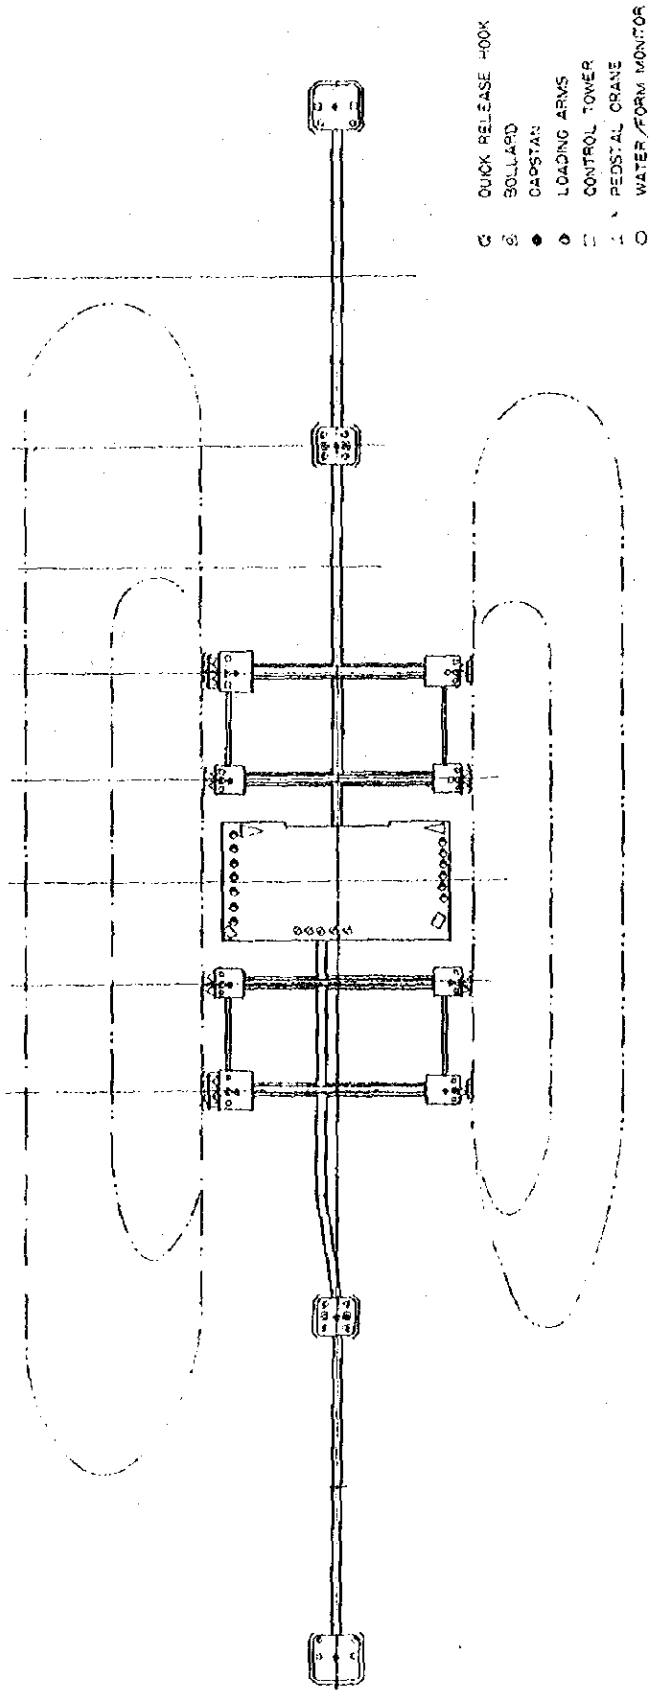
Brief Plan of Fixed Pier Type Sea Berth
